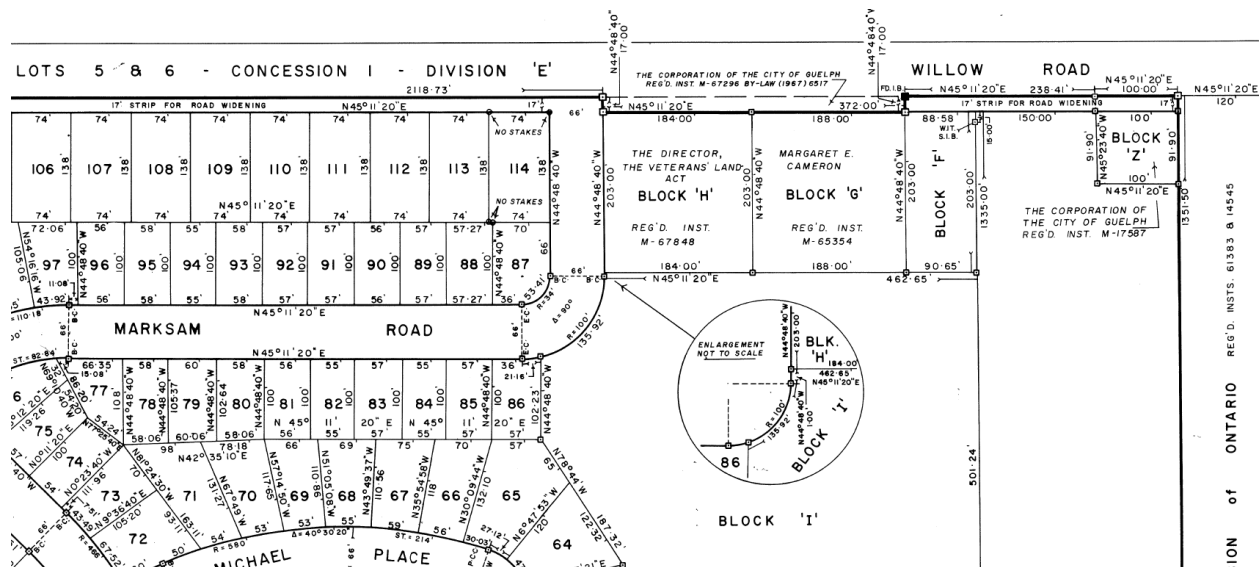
Detail from Plan 615 (sheet 2 of 2) showing Block 'H'. (City of Guelph Engineering Services)
